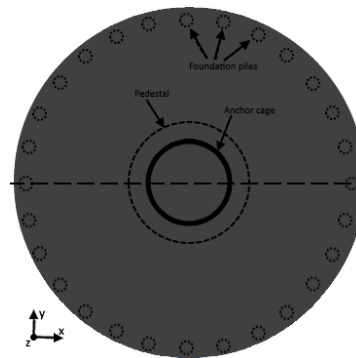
A top view of the foundation structure including the pedestal and the anchor cage. Additionally the placing of the foundation piles has also been indicated
